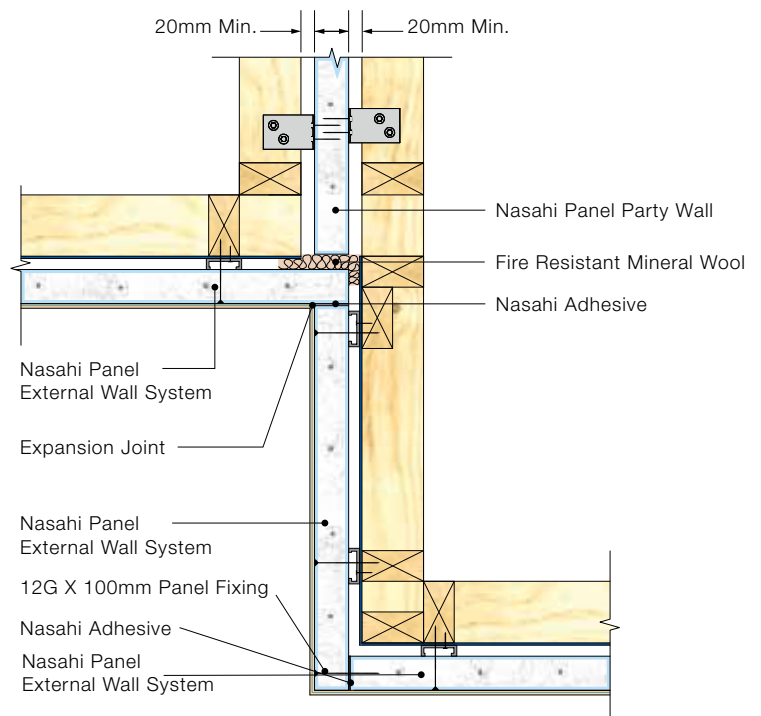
A: PARTY WALL TO OTHER EXTERNAL WALL JUNCTION CLADDING
